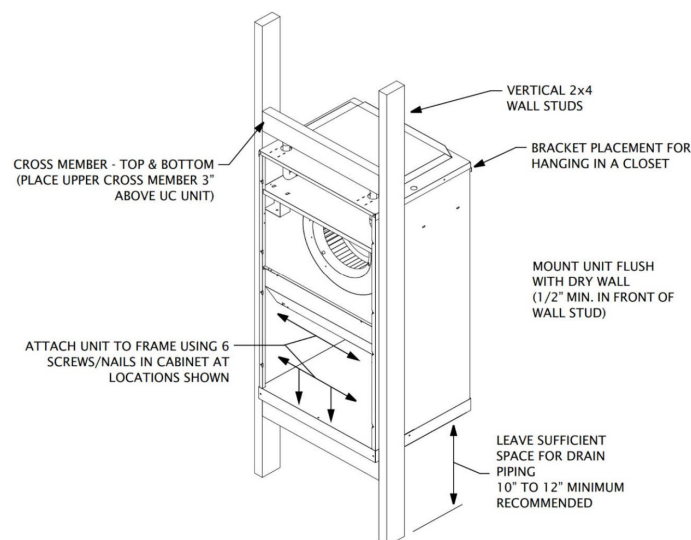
UC-Hydronic Heat Recessed Wall Mounting (Support Framing)
